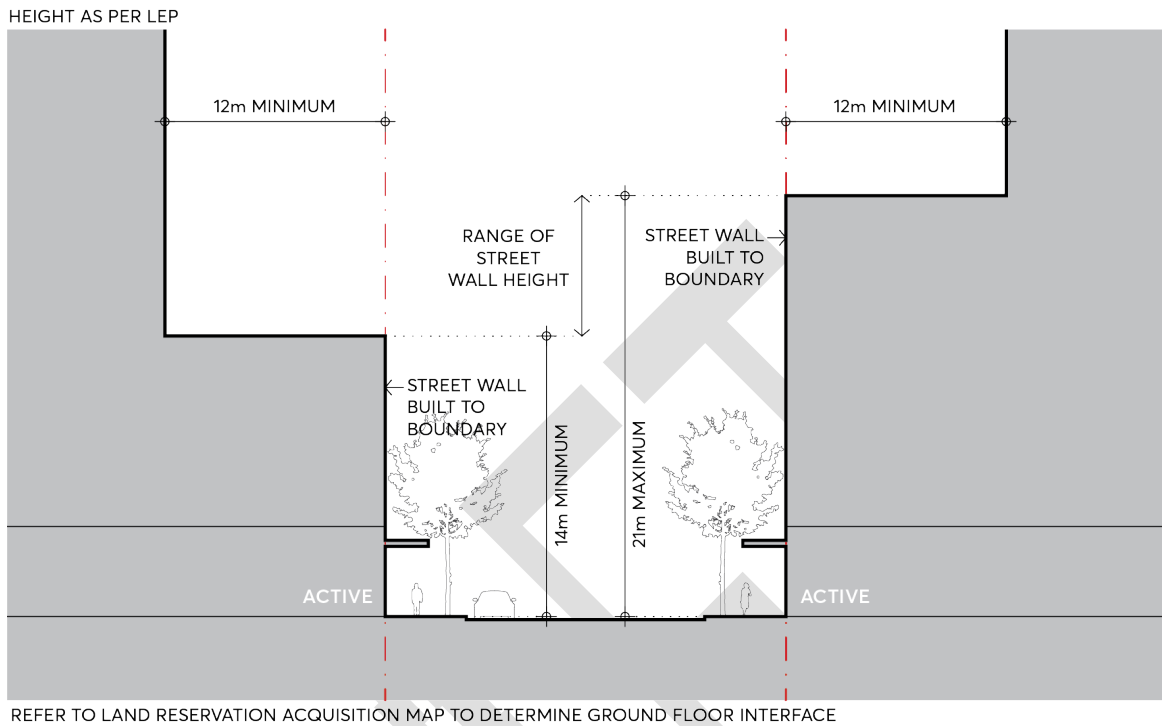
George Street - Street Setbacks and Street Wall Height
